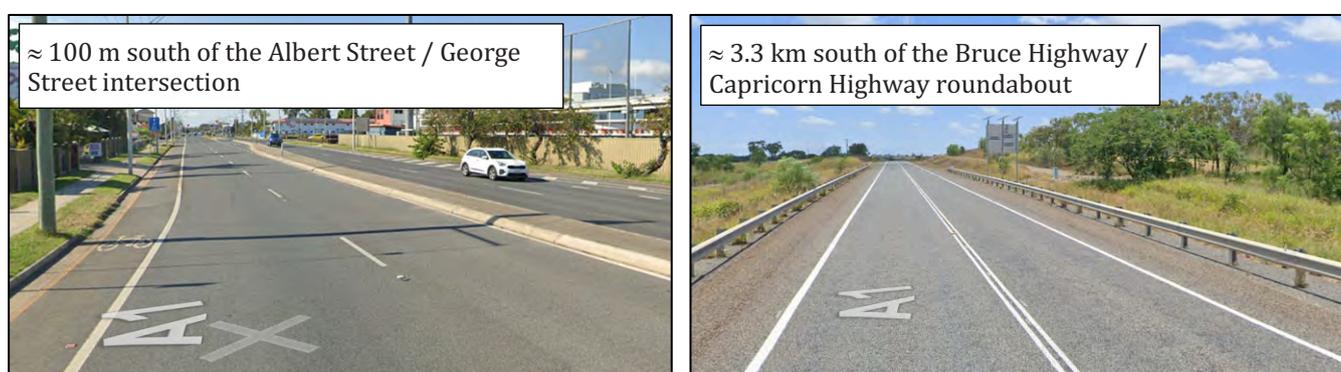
Bruce Highway pavement conditions in year 2022 at various locations [Source: Google Street View]
